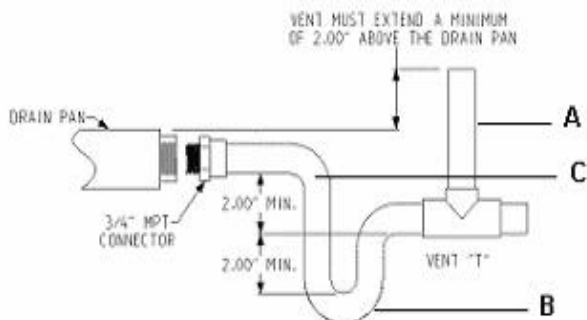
Typical condensate drain connection with A- Antisiphon Air Vent, B- Drain Trap, and C- Drain Line. Secondary drain not shown.
